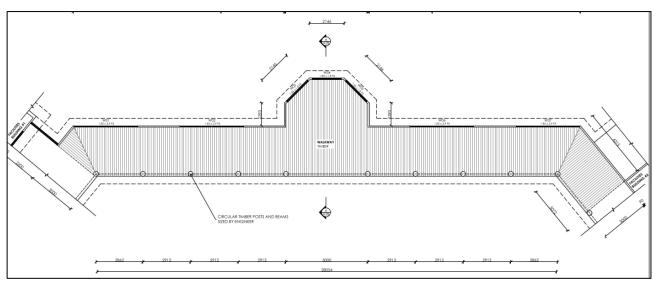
Covered walkway - floor plan (Source: RFS Projects)
